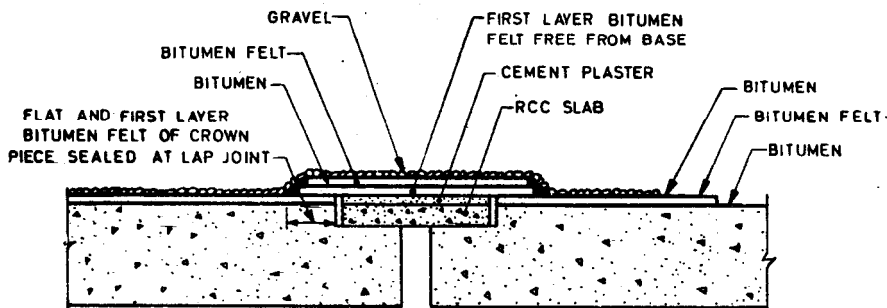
TYPICAL DETAILS OF EXPANSION JOINT IN LEVEL WITH ROOF SURFACE
